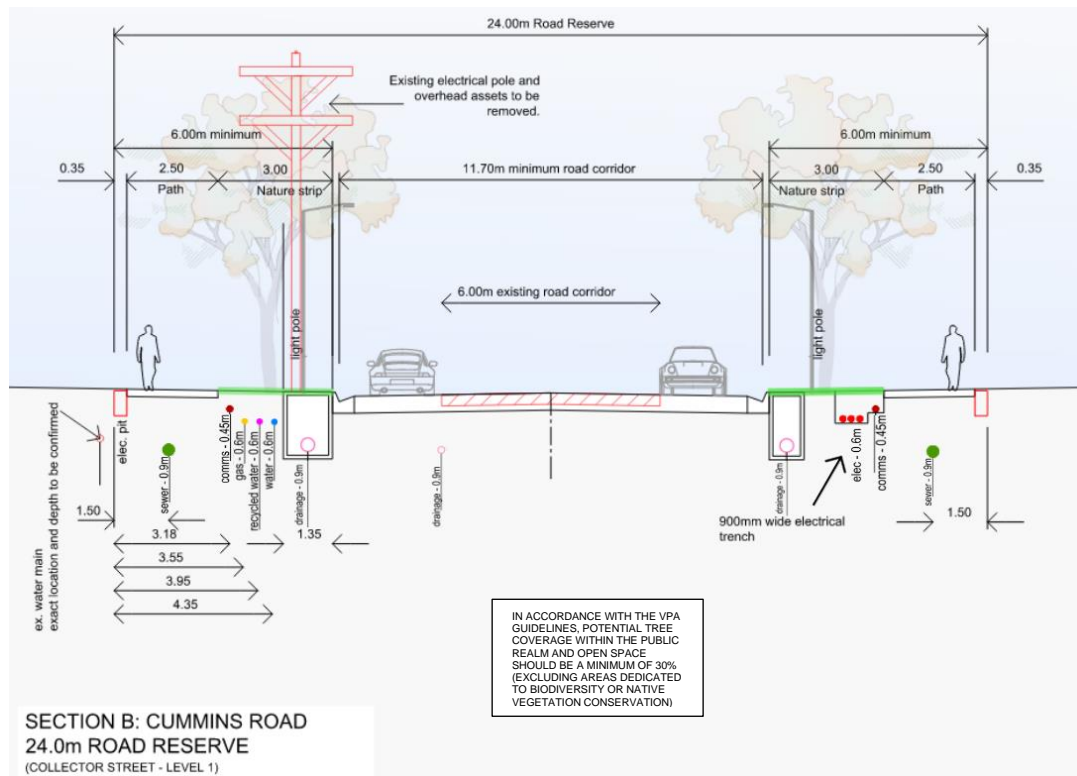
Typical Cross Section - Collector Street Level 1 (Cummins Road)
